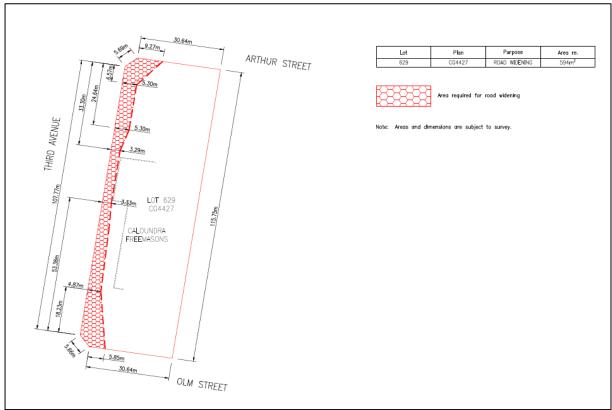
Resumption Plan 19 Third Avenue, Caloundra
